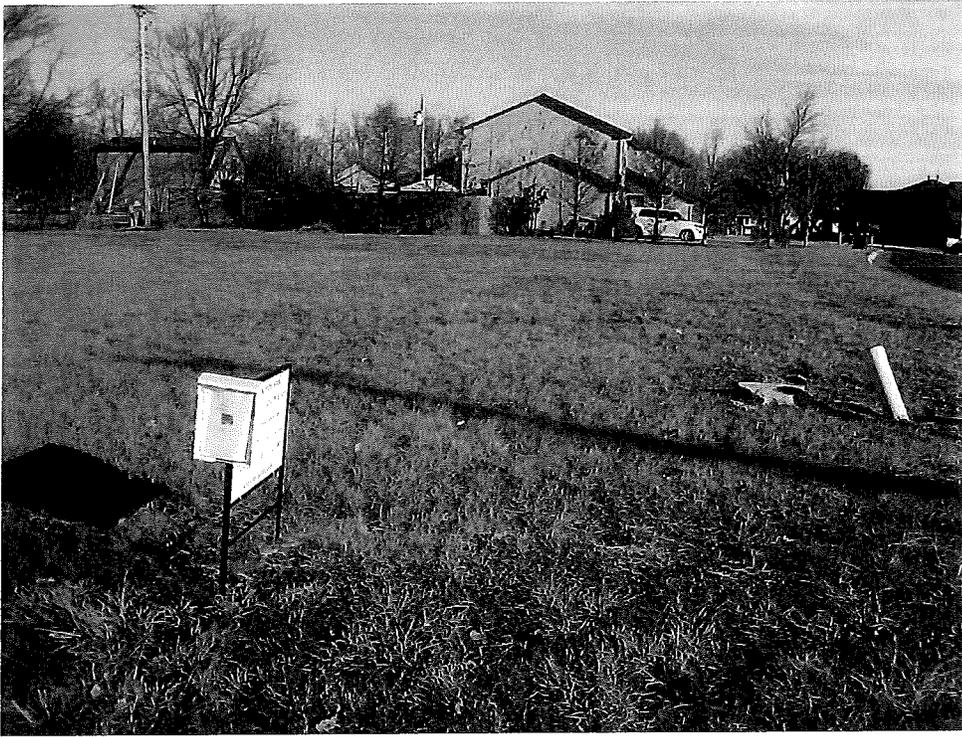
Proposed building site (4-plex structure). Duplexes located to the north.
